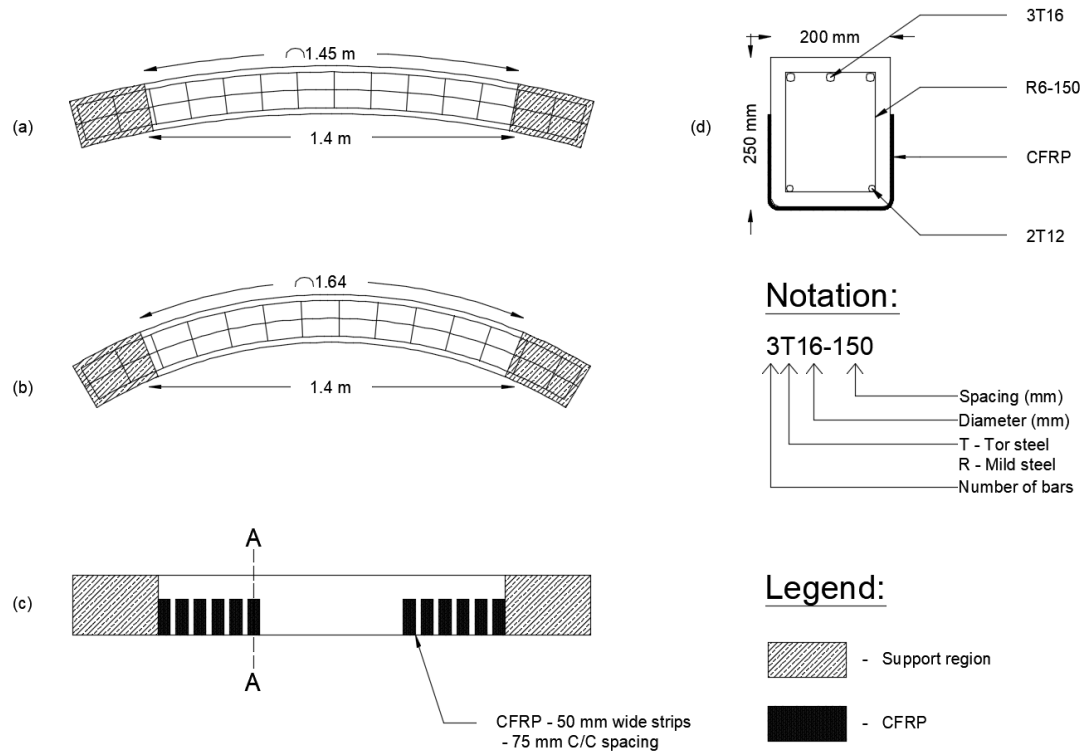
Schematics of specimens of series 2 (a) Plan view of a curved beam with 4 m radius (b) Plan view of a curved beam with 2 m radius (c) Side view of a CFRP strengthened beam (d) Sectional view of A-A.
